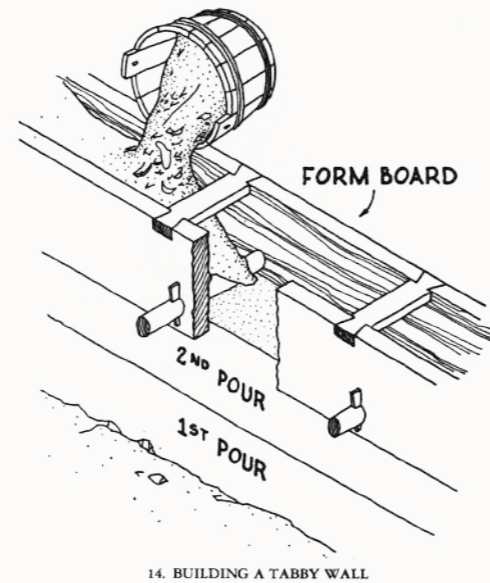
Building a tabby wall. Image source: The houses of St. Augustine
